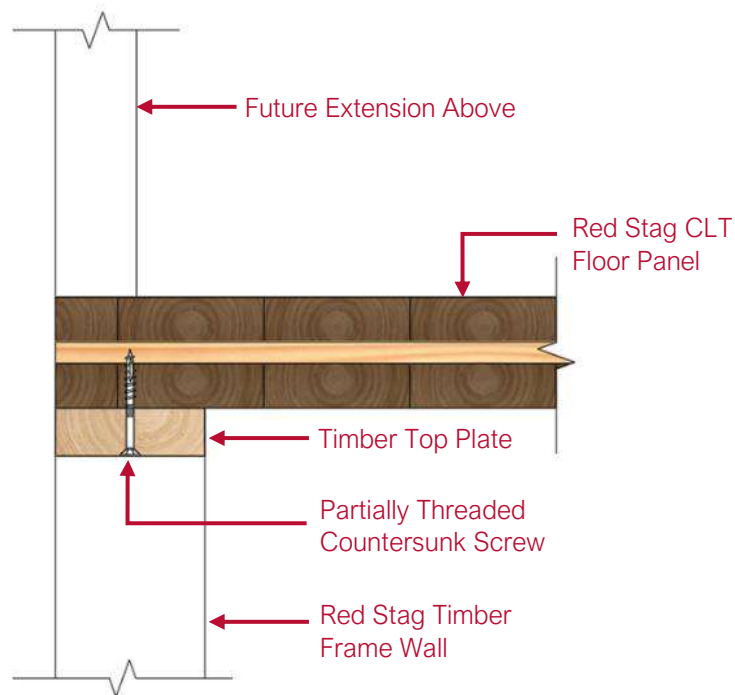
Timber frame wall to Red Stag CLT floor panel connection.
